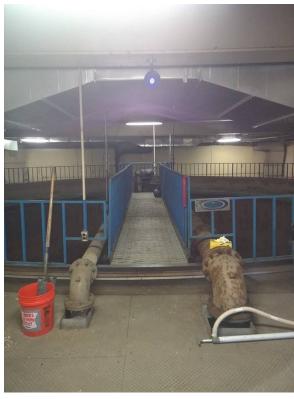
Center Column of Thickener No. 1, looking South at locations 1 and 16 thru 20.
